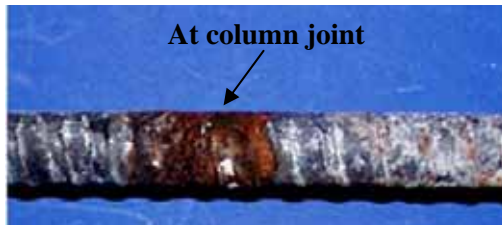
Reinforcement Condition for Specimen PT-TC-S-PD<sup>1</sup>
